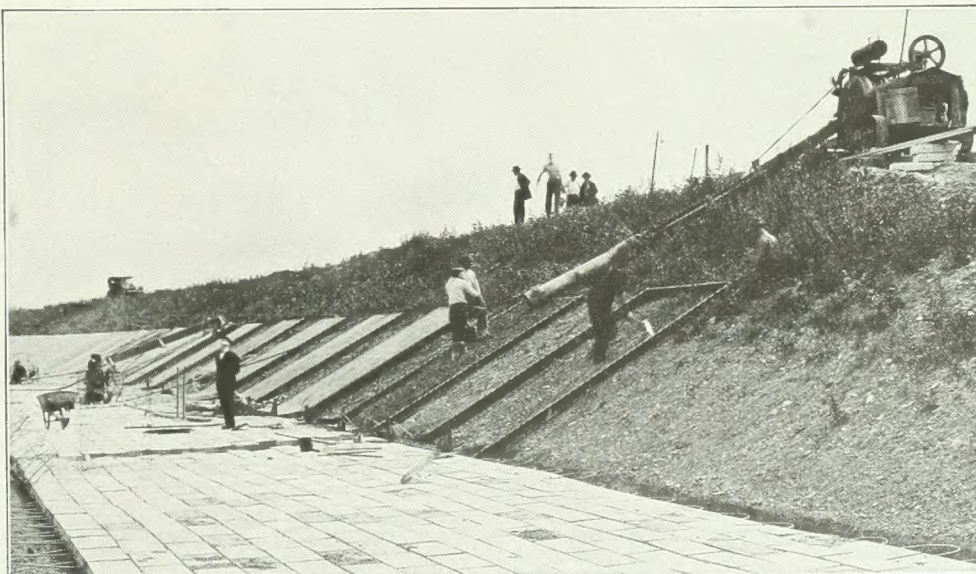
CASTING THE CONCRETE REVETMENT SLABS, JUNE 2, 1920
